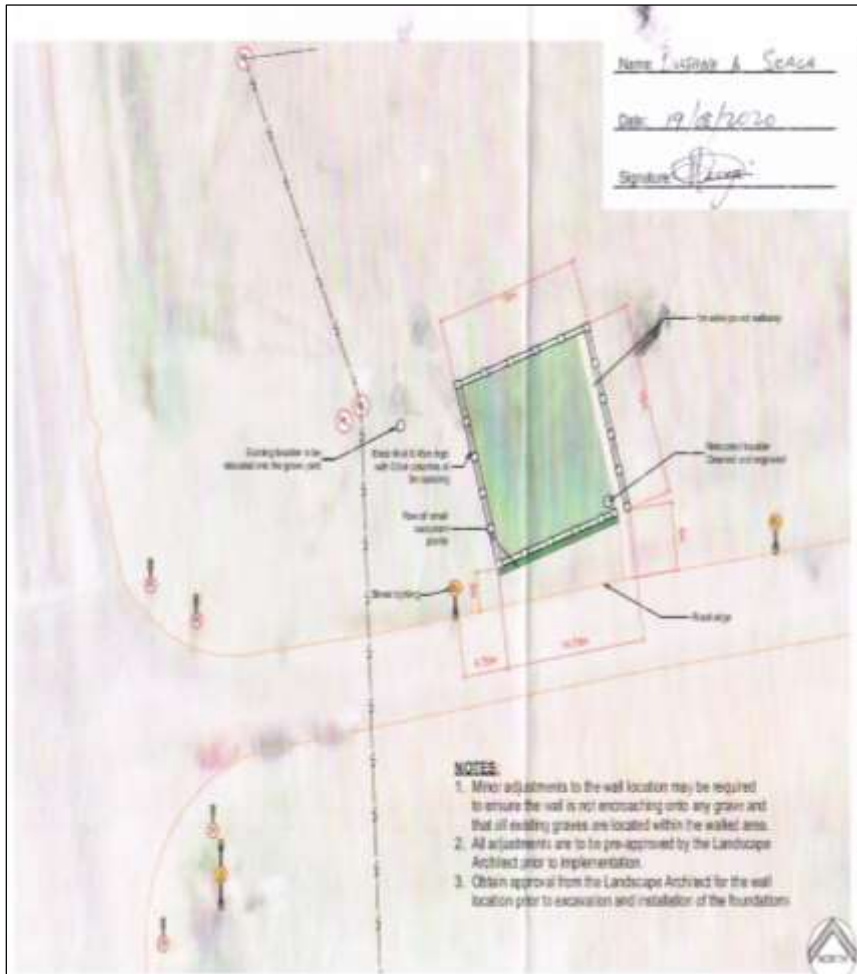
Layout plan of the proposed installations: Perimeter fencing, a memorial stone placed near the entrance to the enclosure, and a paved walkway along the eastern perimeter.
